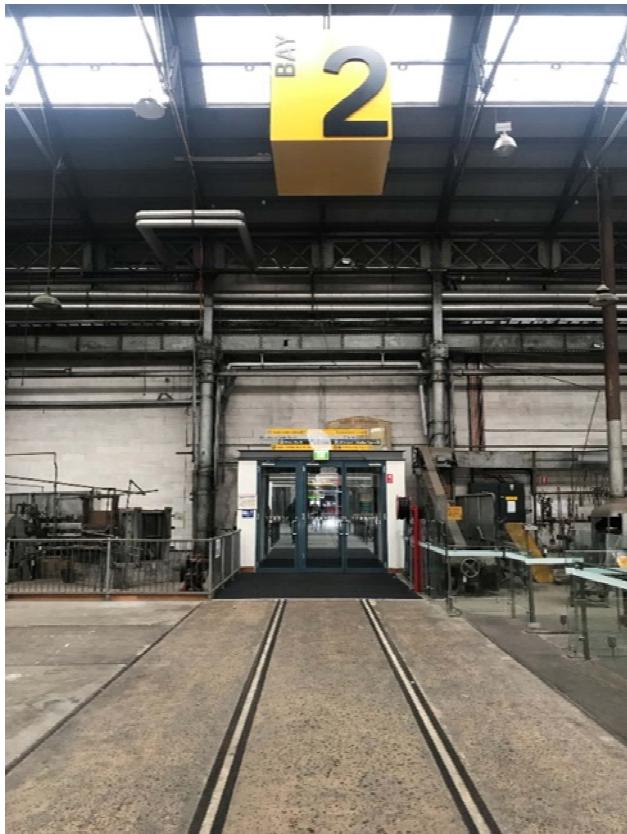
View of the existing wall and doorway separating Bays 2 and 3 from Bay 2
